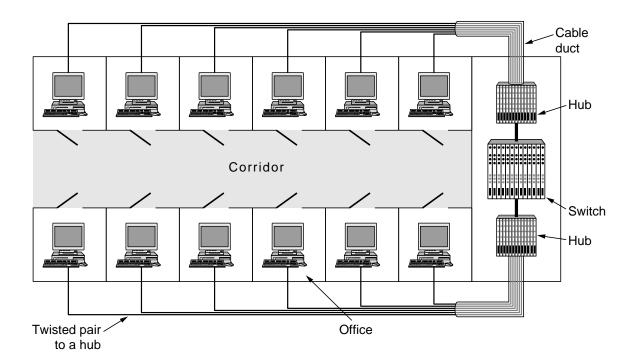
A building with centralized wiring using hubs and a switch.
